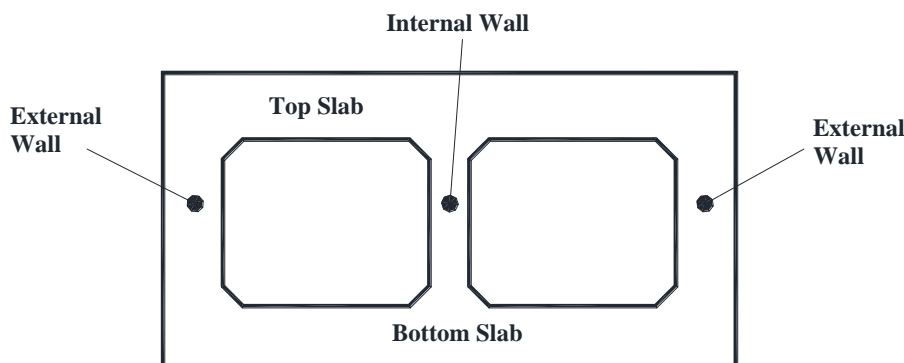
Section, R/B-B/B Connecting Service Tunnel
